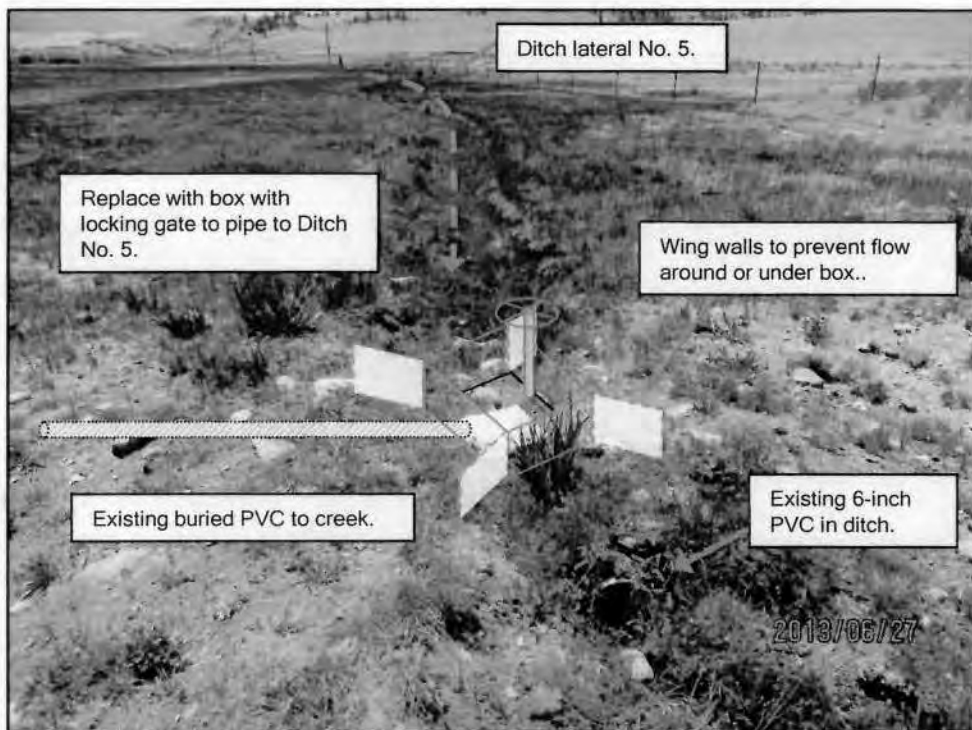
Plan for new diversion box for Ditch Lateral No. 5 (looking northeast).
